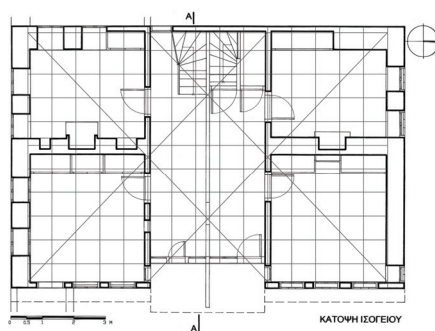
Ground floor plan of Fouzas Mansion in Florina
